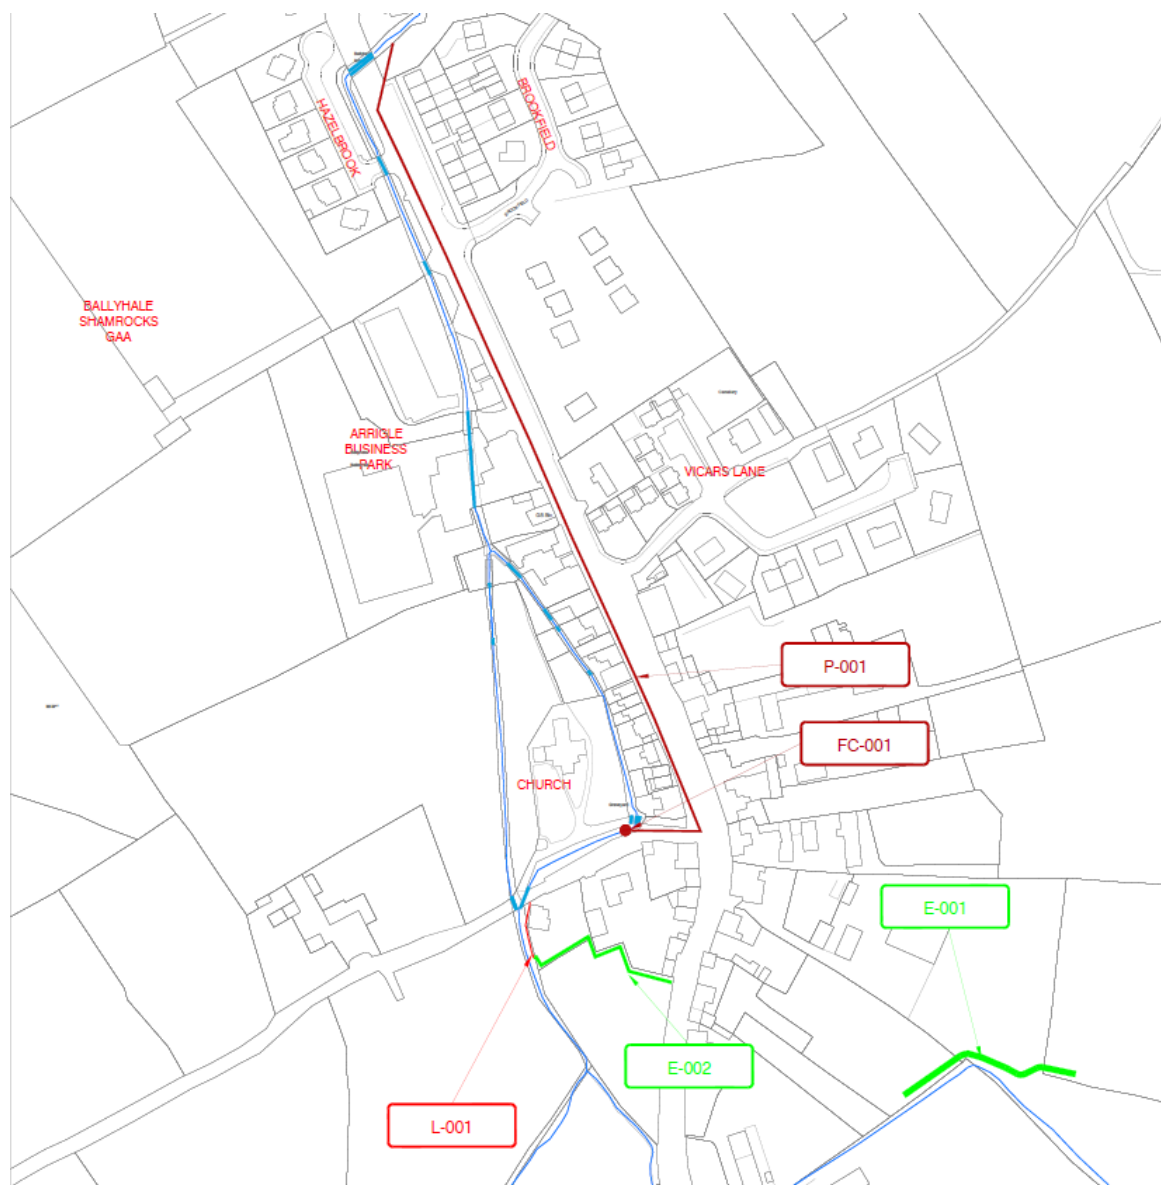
Concept Option D Layout (Refer to Appendix 4.4 for Additional Info)
